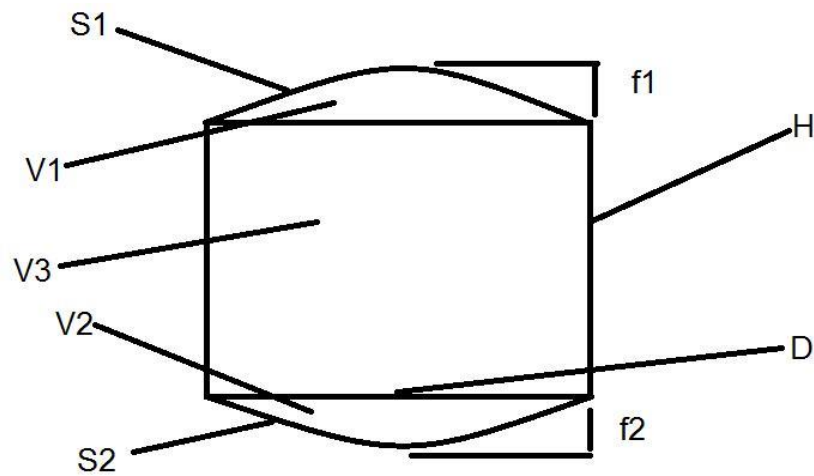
Geometrical dimensions of the cylindrical shaped biogas digester body
